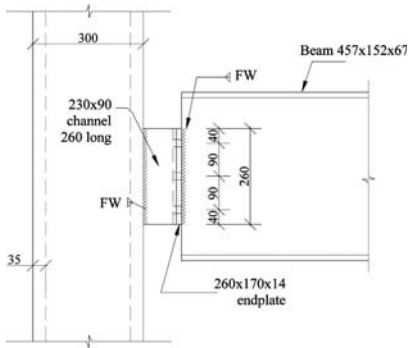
Basic geometrical details of flexible end plate connection to reverse channel.
